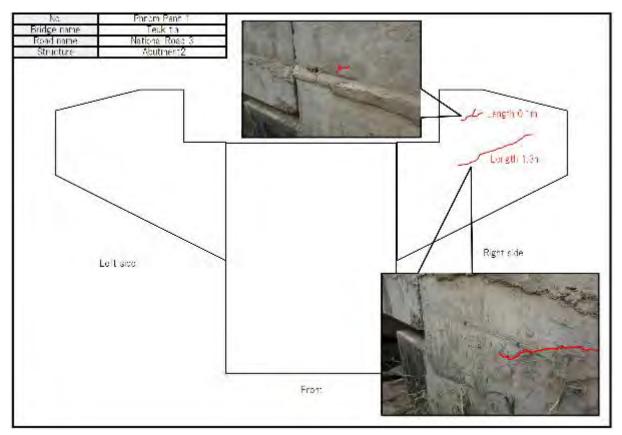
Inspection Sheet (Teuk tla: Phnom Penh. Bridge No. 1)
